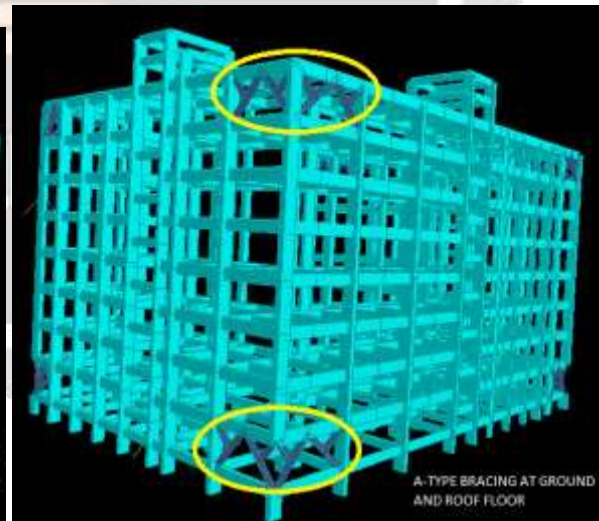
CASE-V Providing Inverted 'A' type bracing at ground and roof floor level.
